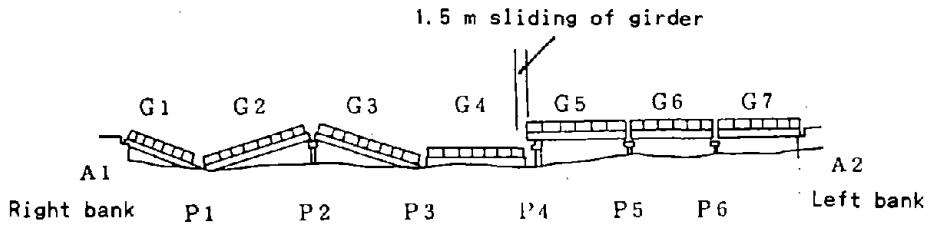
Sketch of Damage to Magsaysay Bridge (after Iemura¹²)
